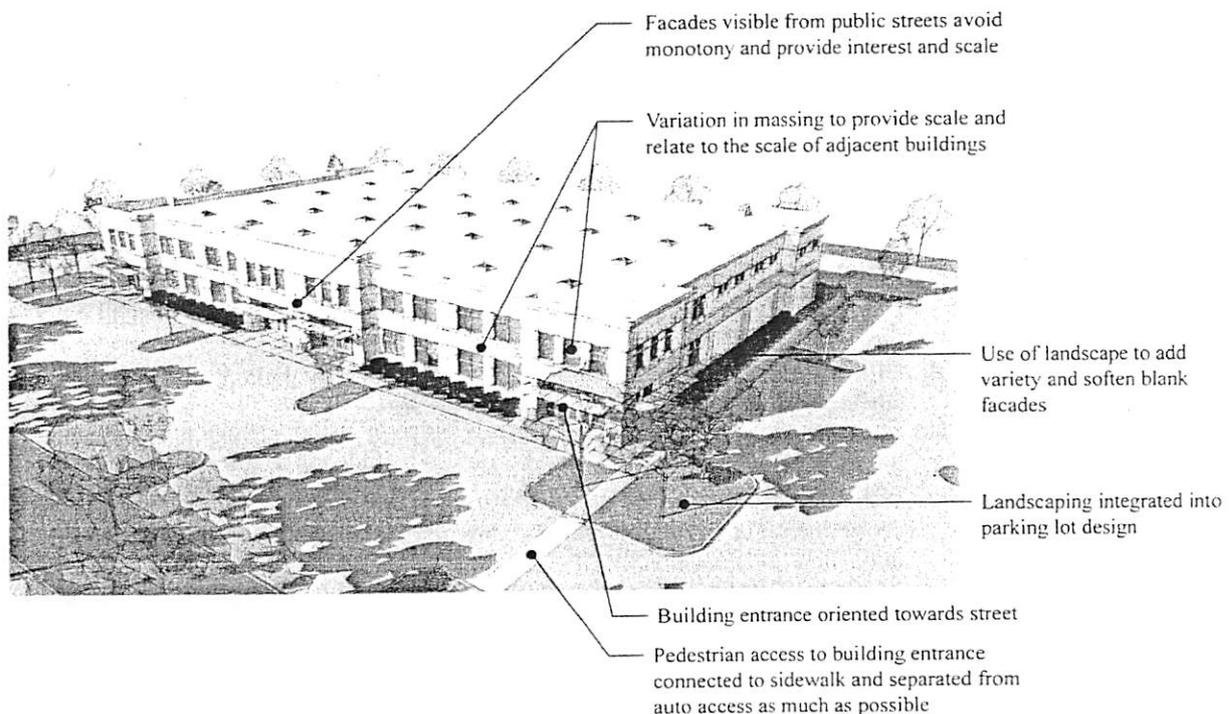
C1: Industrial Building Articulation and Detailing
